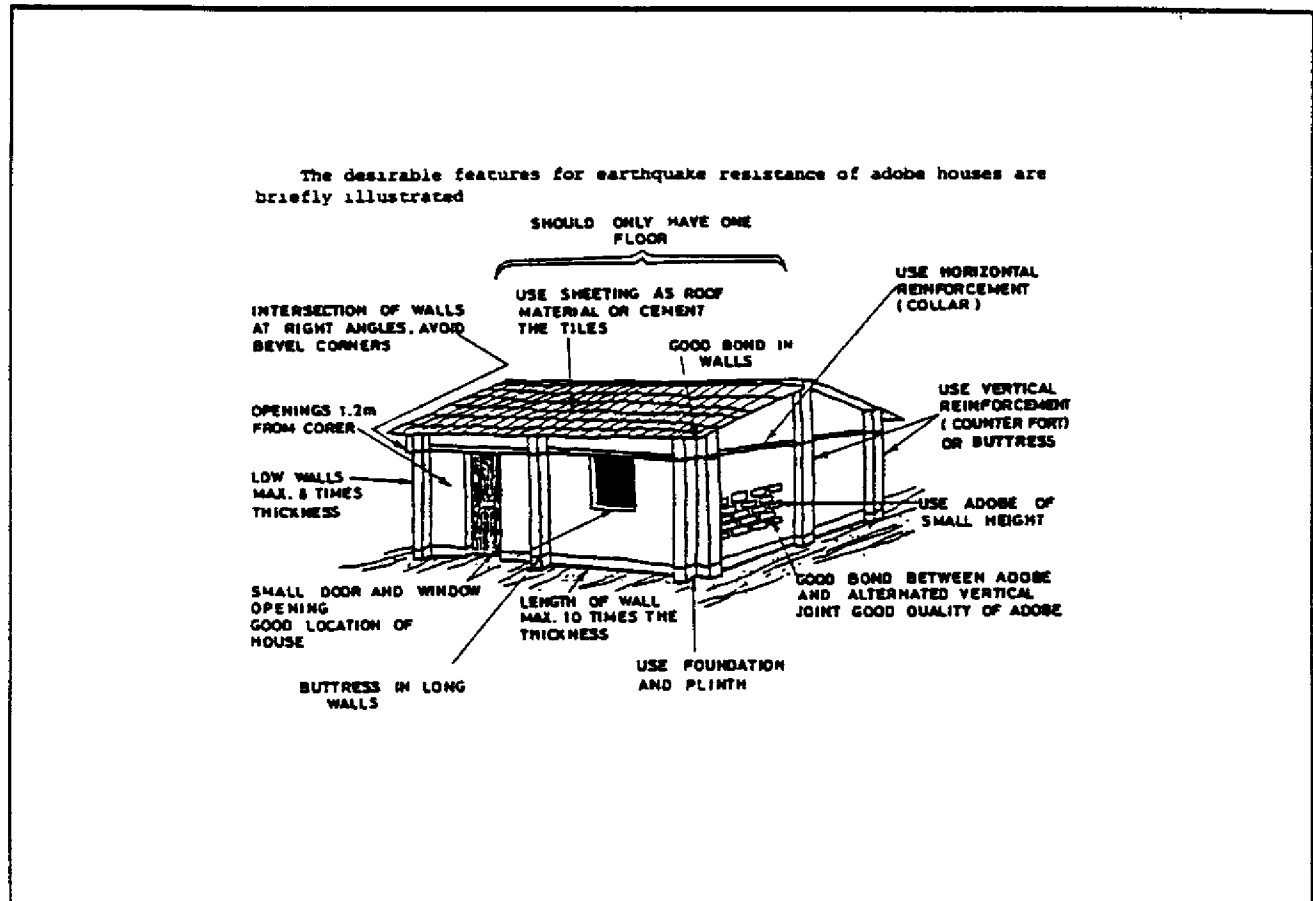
Overall Arrangement of Reinforcing Adobe Buildings [1].
